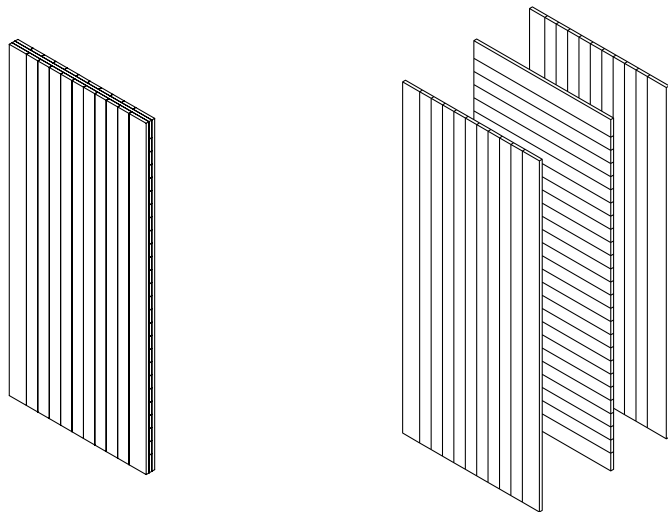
Exterior Door – Option D: Cross-Laminated Timber – Assembled & Exploded Views
